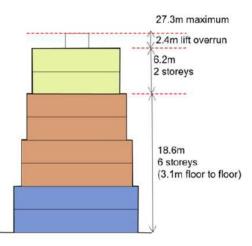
Indicative building envelope section with existing controls (blue), reforms (orange) and Housing SEPP AH bonus (yellow)
